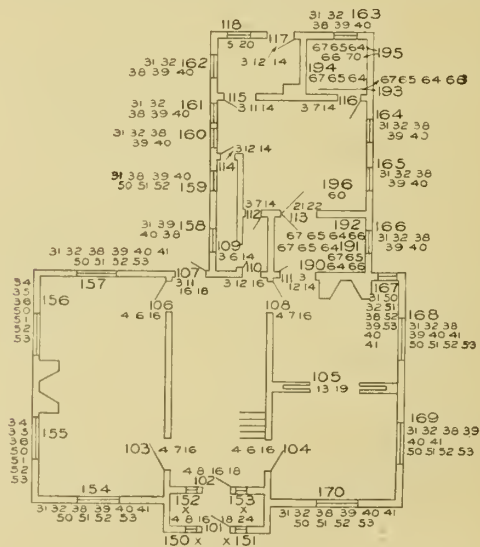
First-Floor Plan, with Hardware Items Indicated.
